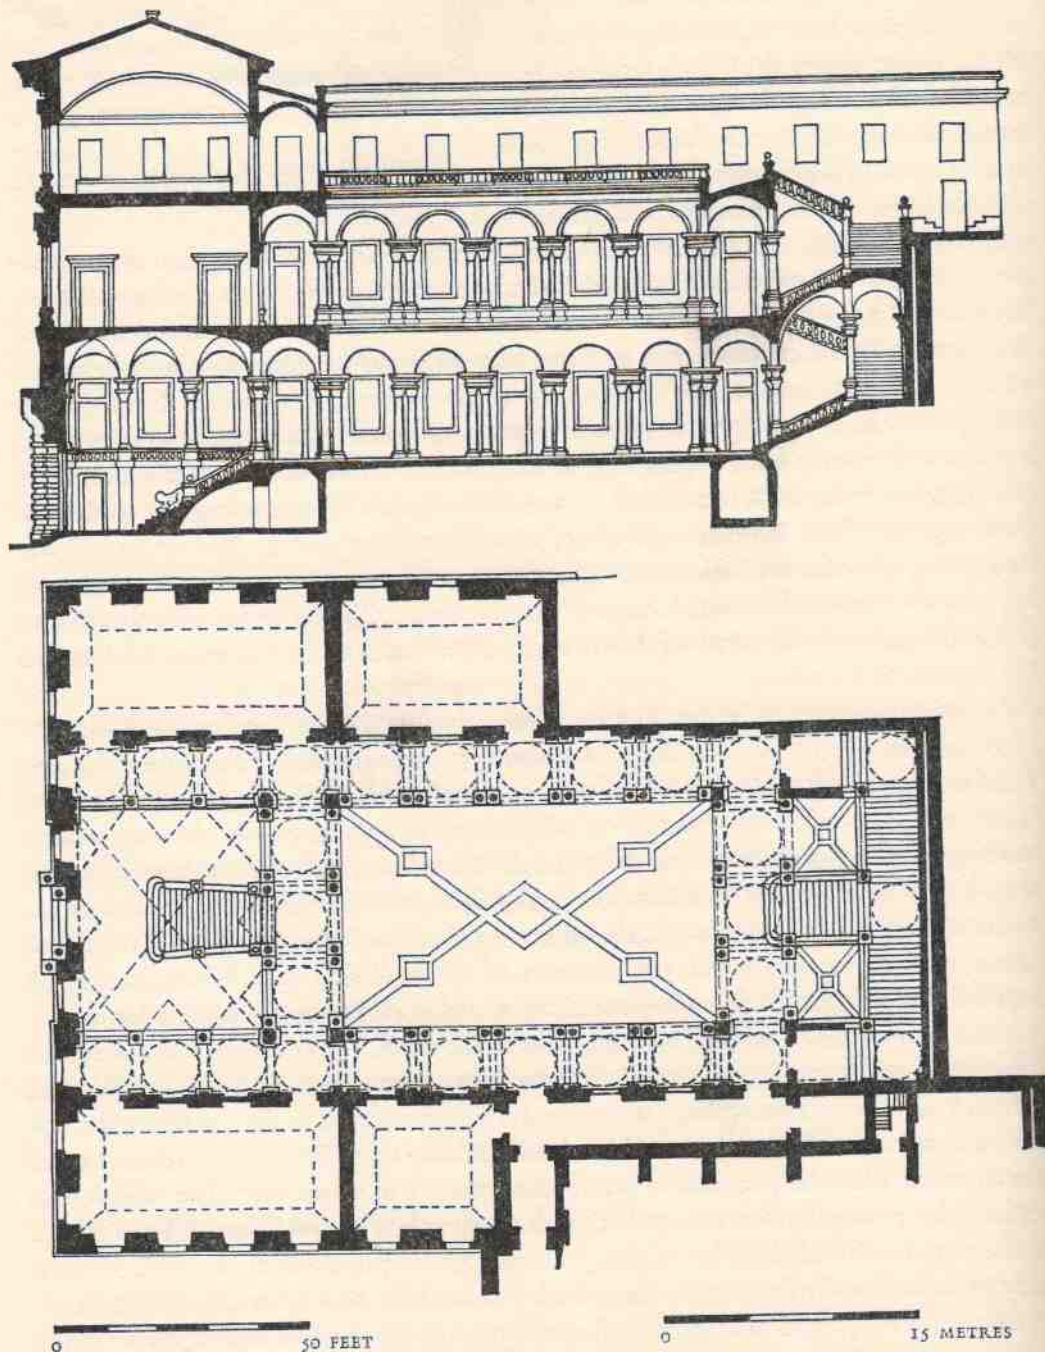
Bartolomeo Bianco: Genoa, University, planned 1630. Section and plan
